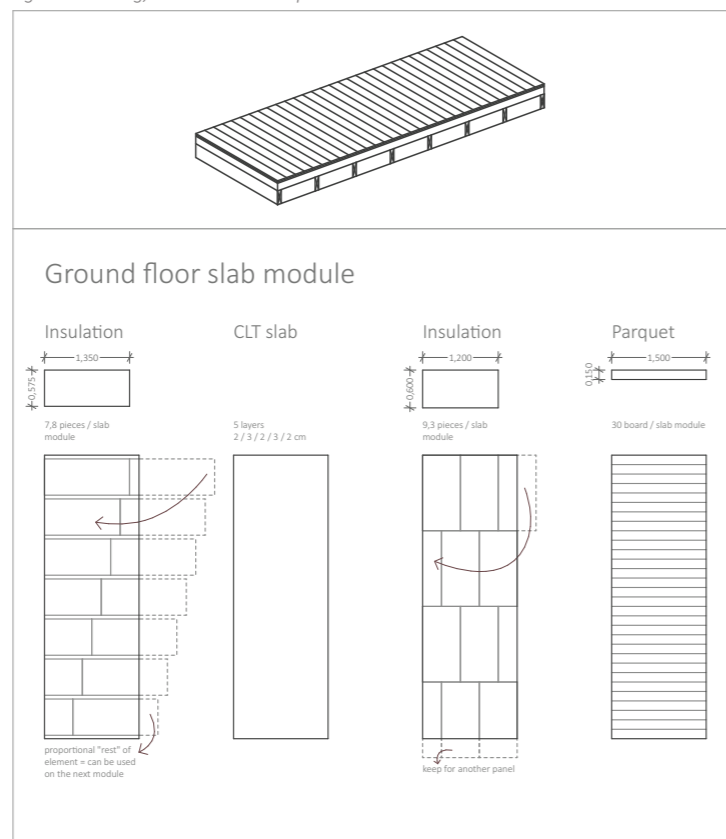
Drawing, Ground-floor slab composition - 1:20. ©Personal illustration.
